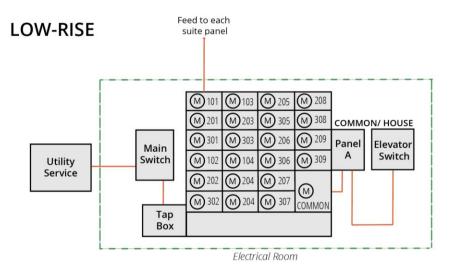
Electrical system in a typical low rise MURB Created by: FRESCo
